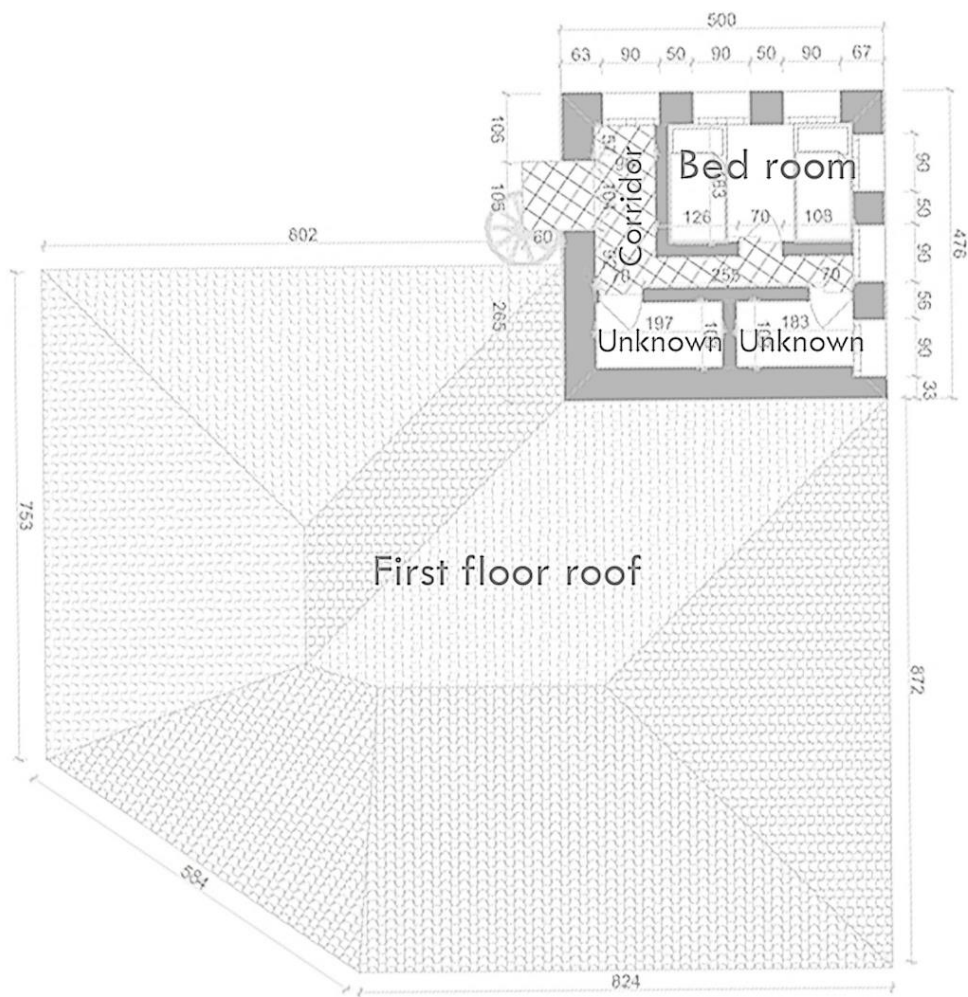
Existing second-floor plan (Source: Fieldwork Measurement & Drawing by The Data Collectors)
